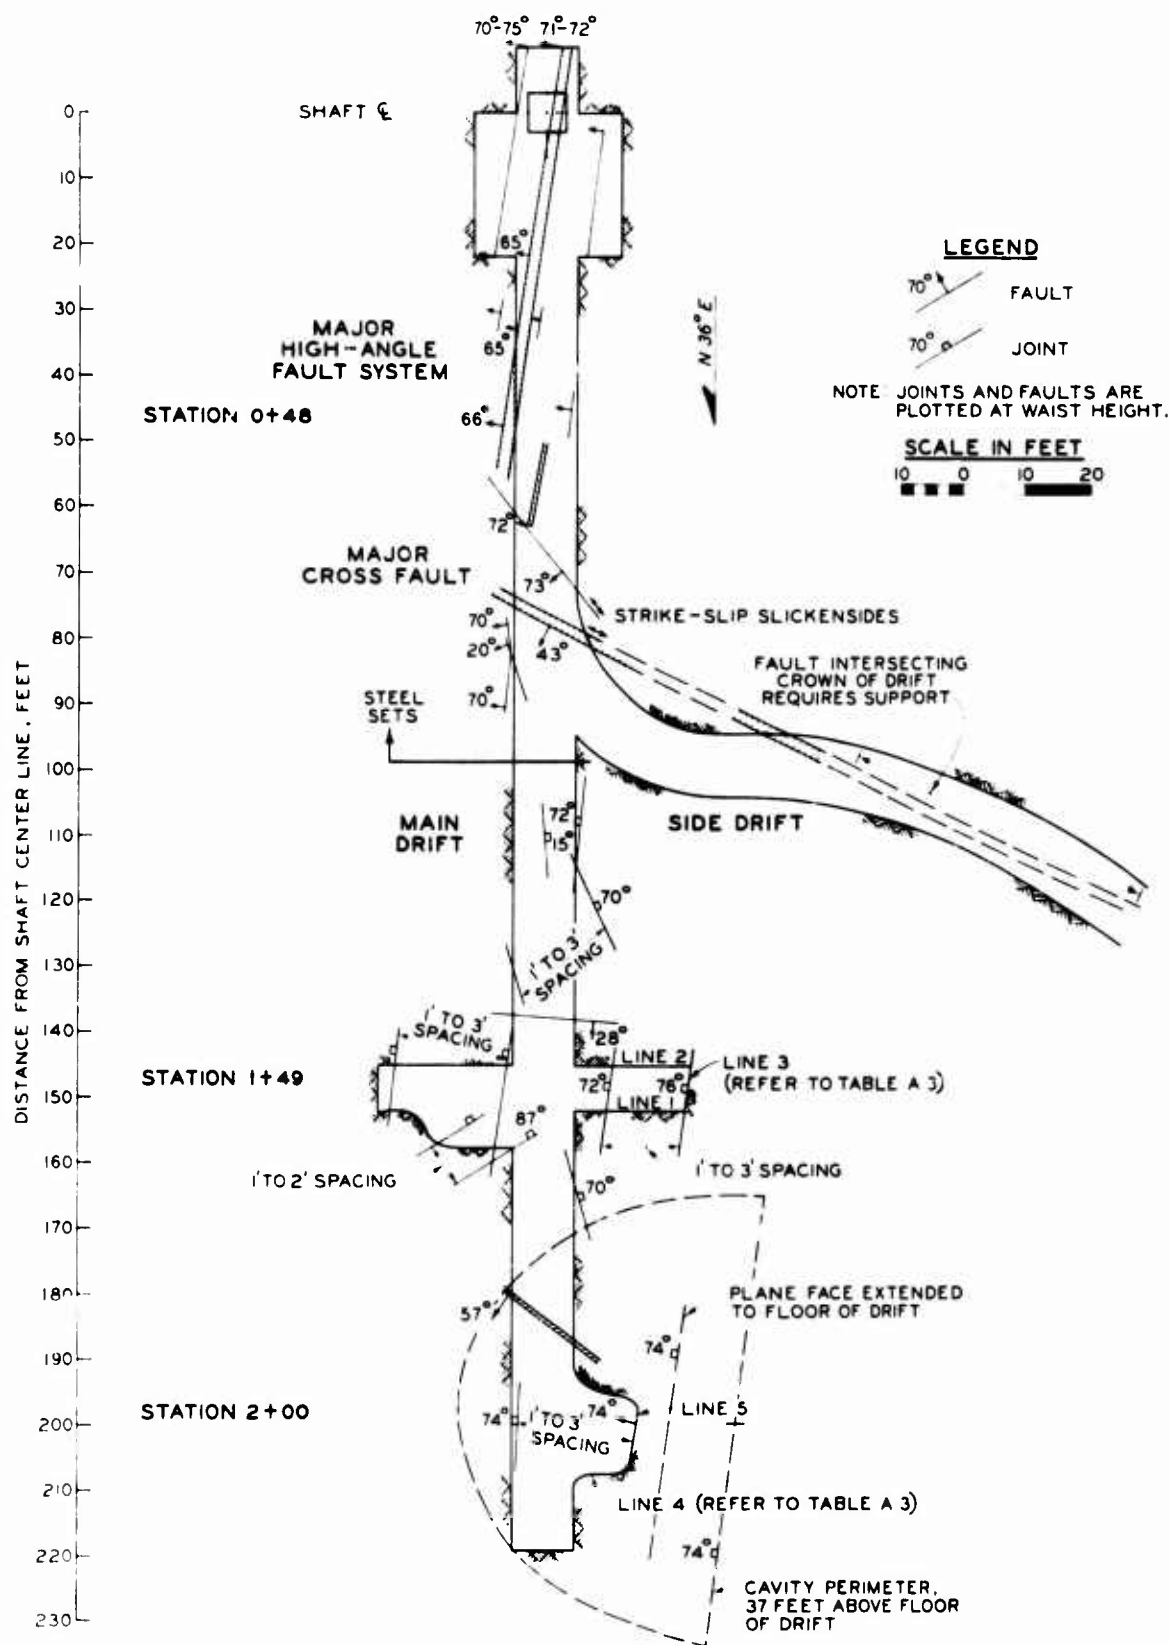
Plan of Cavity III and access drift, showing major joint and fault systems
